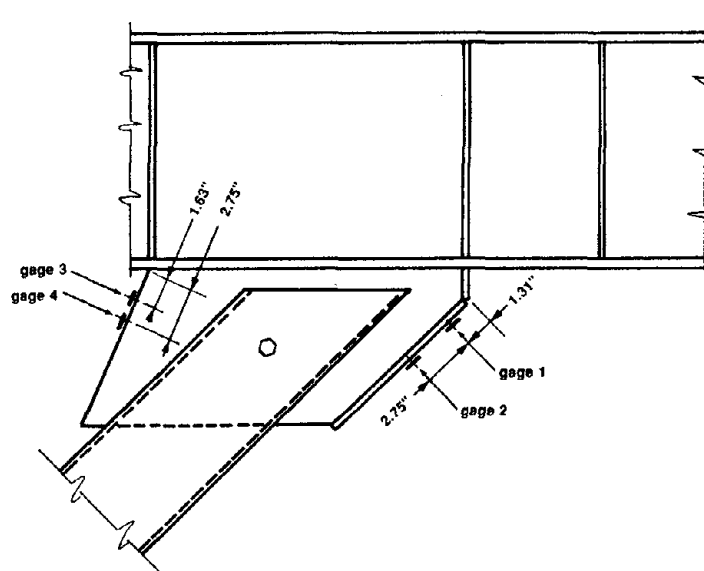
Specimen 9 - Location of Strain Gages on Brace Connection
